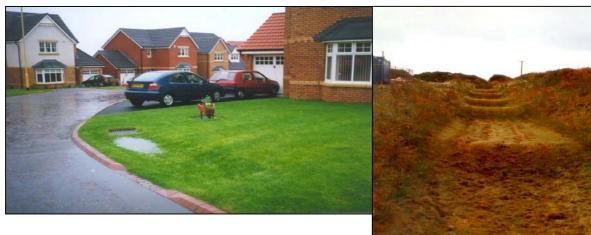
Swale inlets through depressed kerbs (above) and rock protected pipes (under steps on right)
